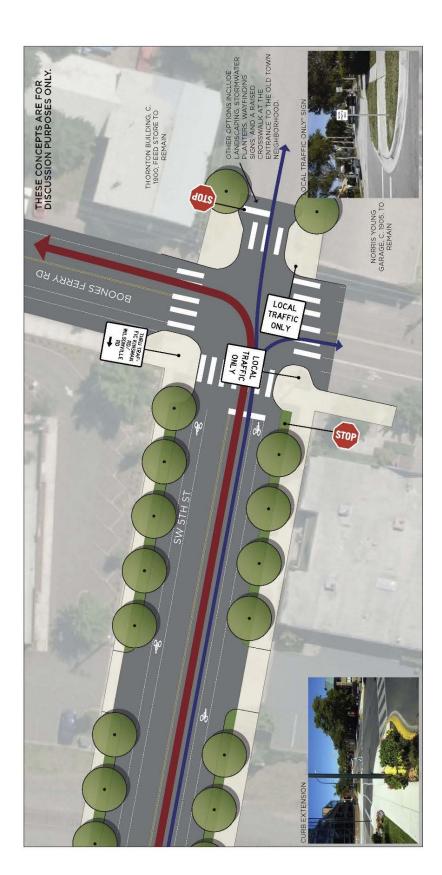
5th St. / Boones Ferry Road Intersection Plan
